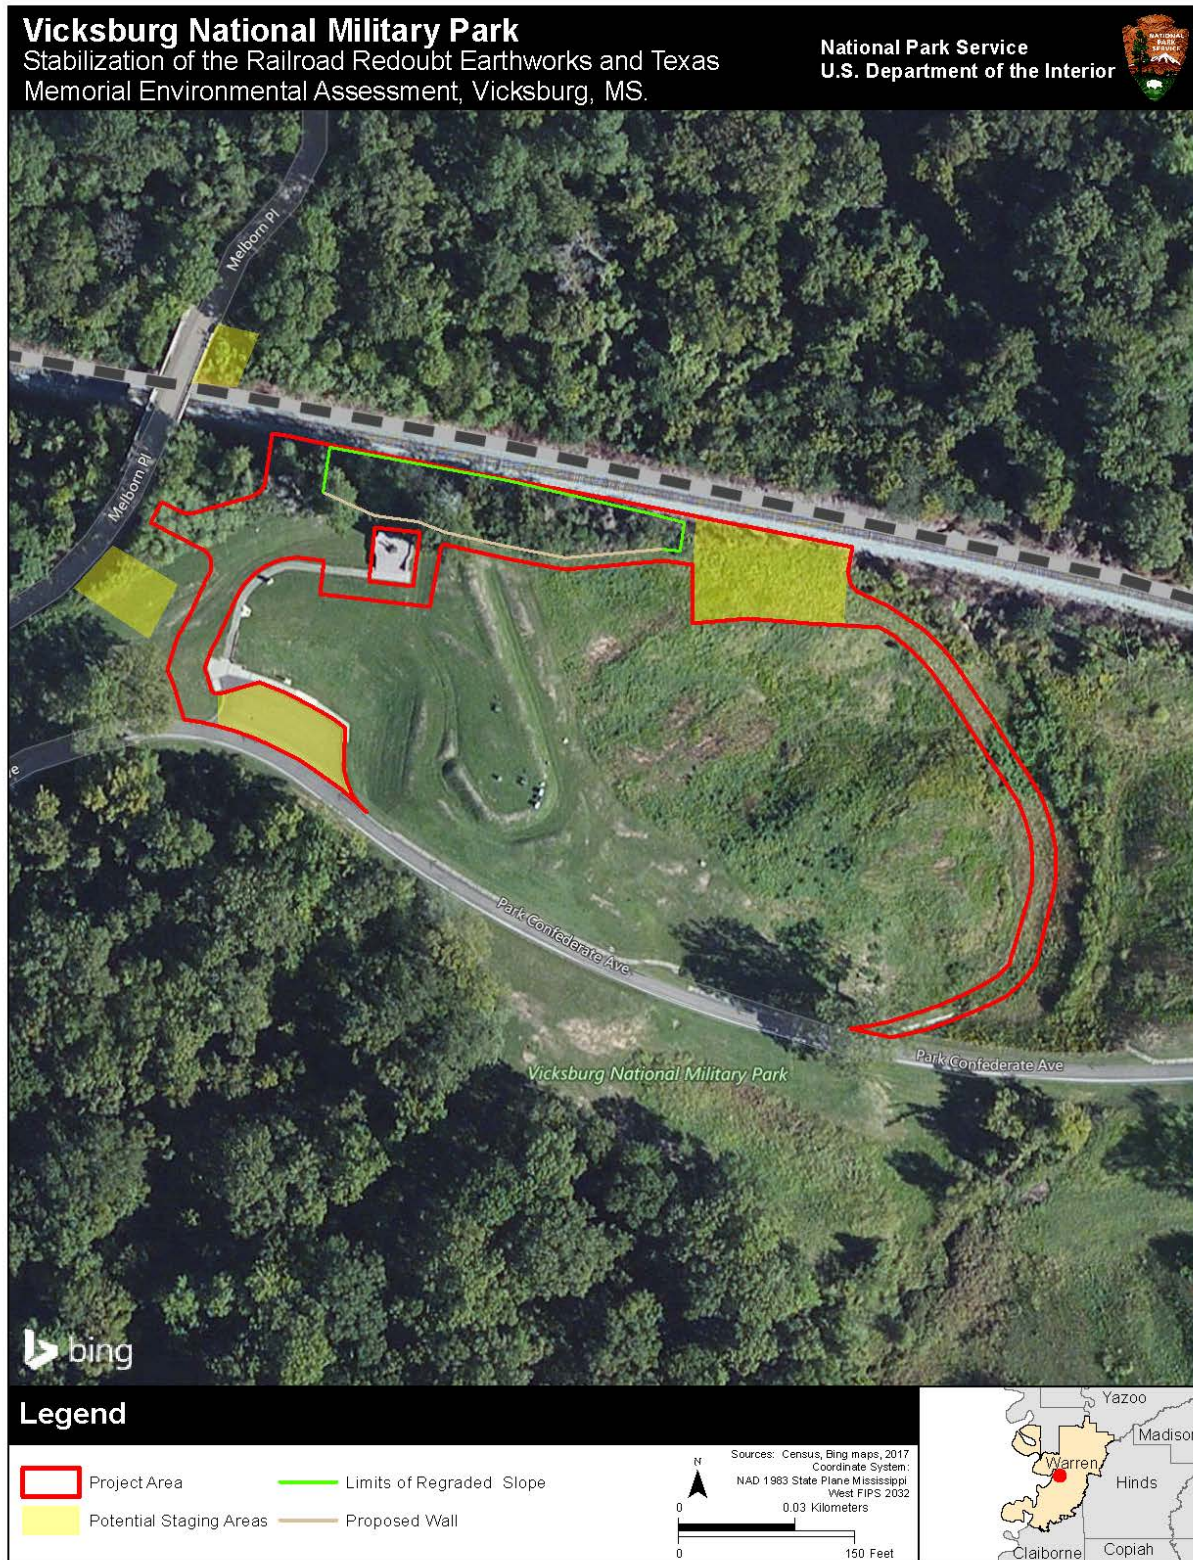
CONSTRUCTION ACCESS AND STAGING LOCATIONS
